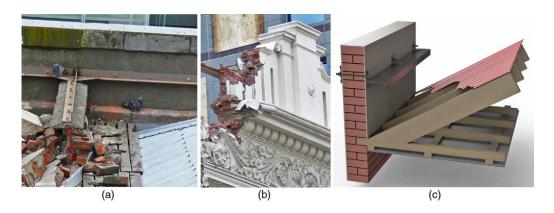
Examples of parapet retrofits utilising the addition of a steel strip on the back of the parapet connected with adhesive anchors: (a) rear view; (b) front view; (c) design scheme.
